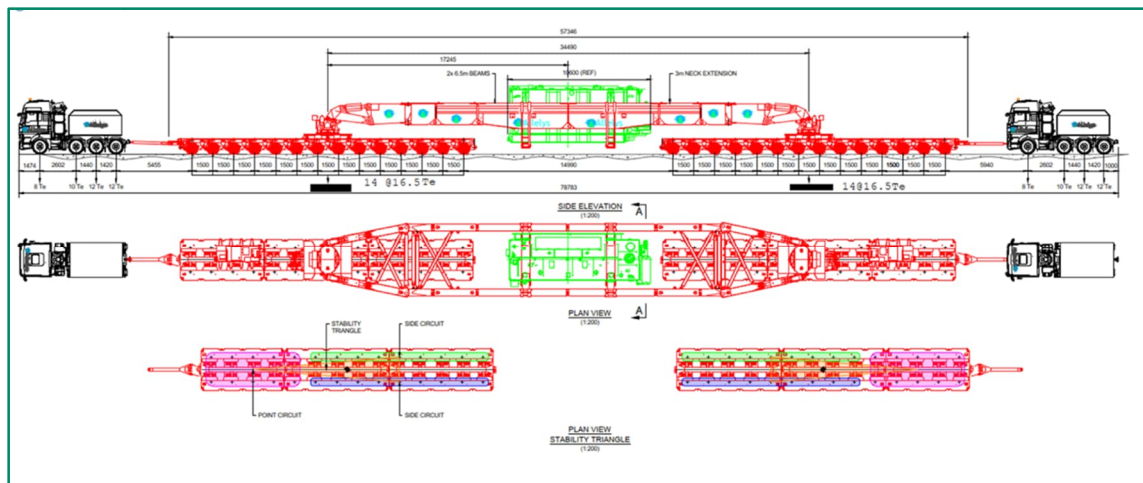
Proposed AIL Transport – 28 Axle Girder Frame Trailer
